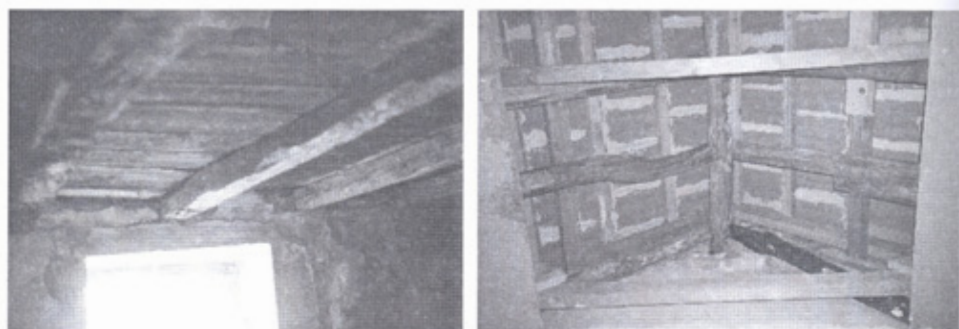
Sanative work from inside, attic board and joists are later removed
